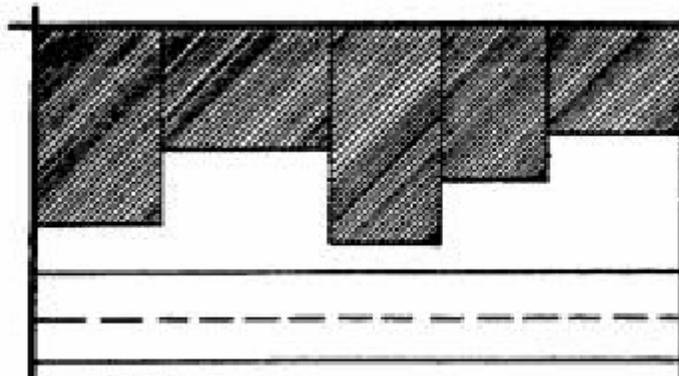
Relatively similar setbacks are better than widely varying setbacks; but any space between the sidewalk and the building should be utilized for pedestrian activities only; no curb-cuts should be allowed. This frontage can be planted; landscaped with hard and soft surfaces; provide outdoor seating for establishments like restaurants, and contribute to a softer streetscape than if buildings come up to lot line uniformly.
